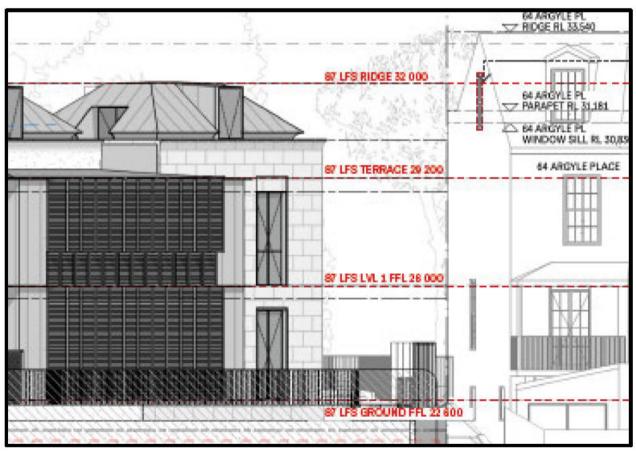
Attic Window outlined in red (Source: Andrew Burns Architecture)
